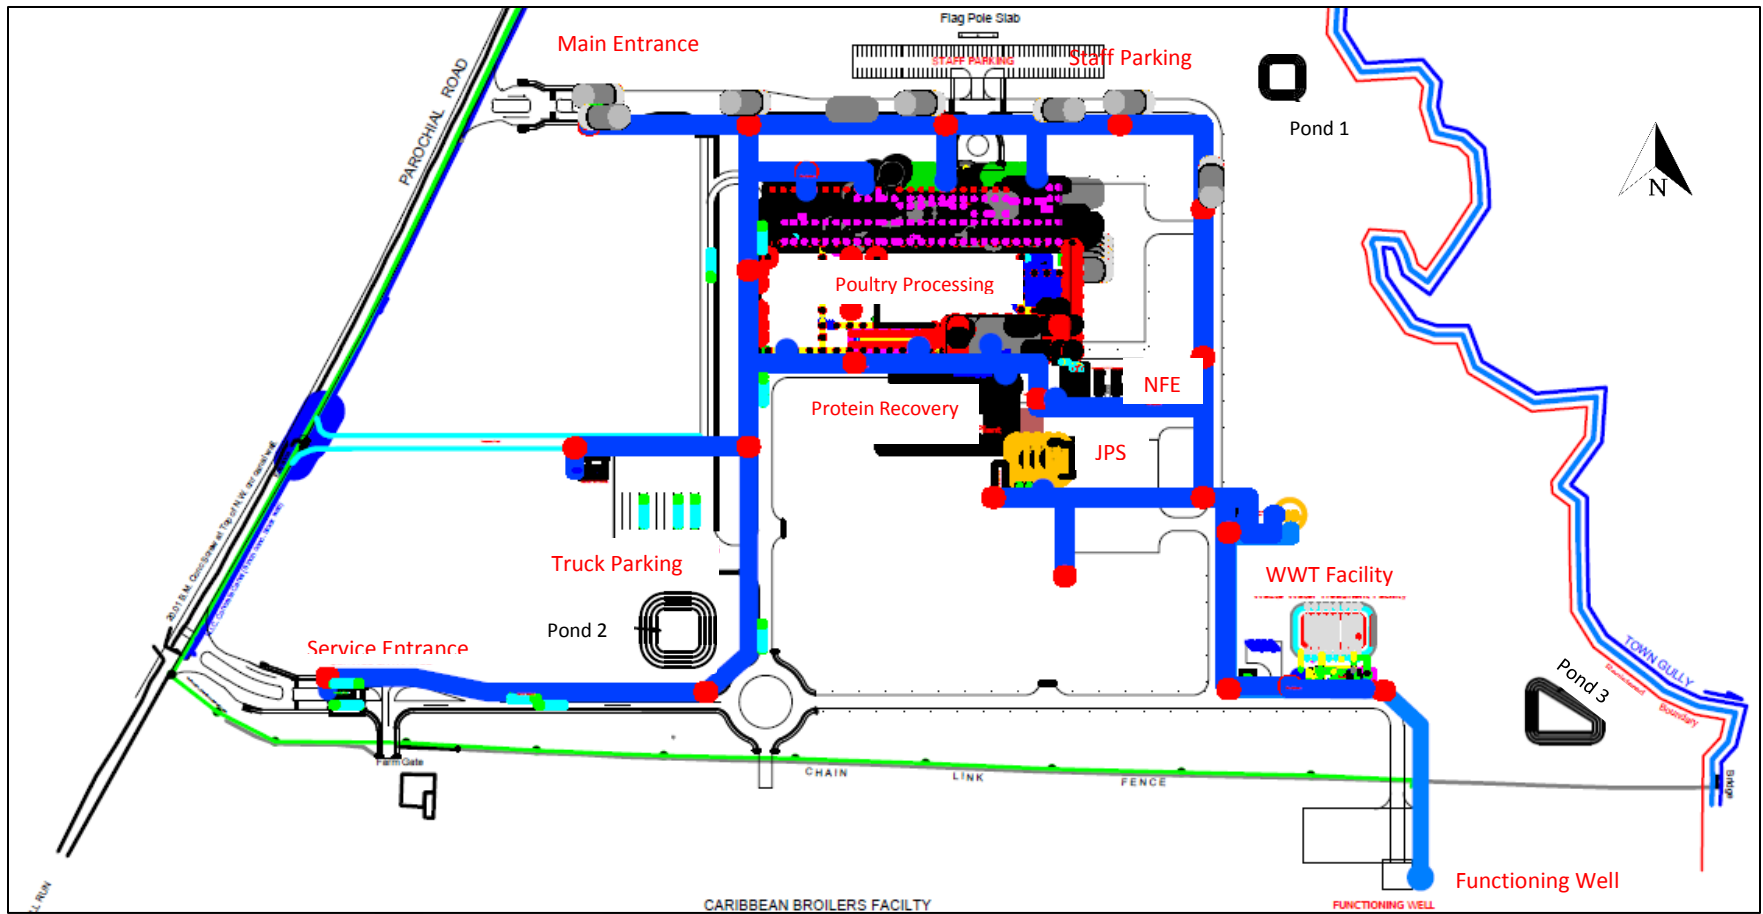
Master Plan Layout of the Caribbean Broilers Facility (See Appendix III)
